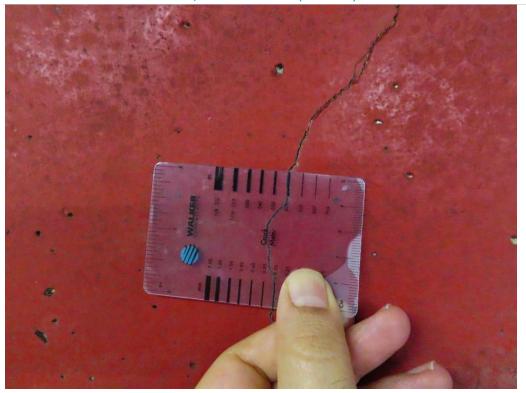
Visual signs of rebar corrosion, Exterior - West elevation (SH2-343)
